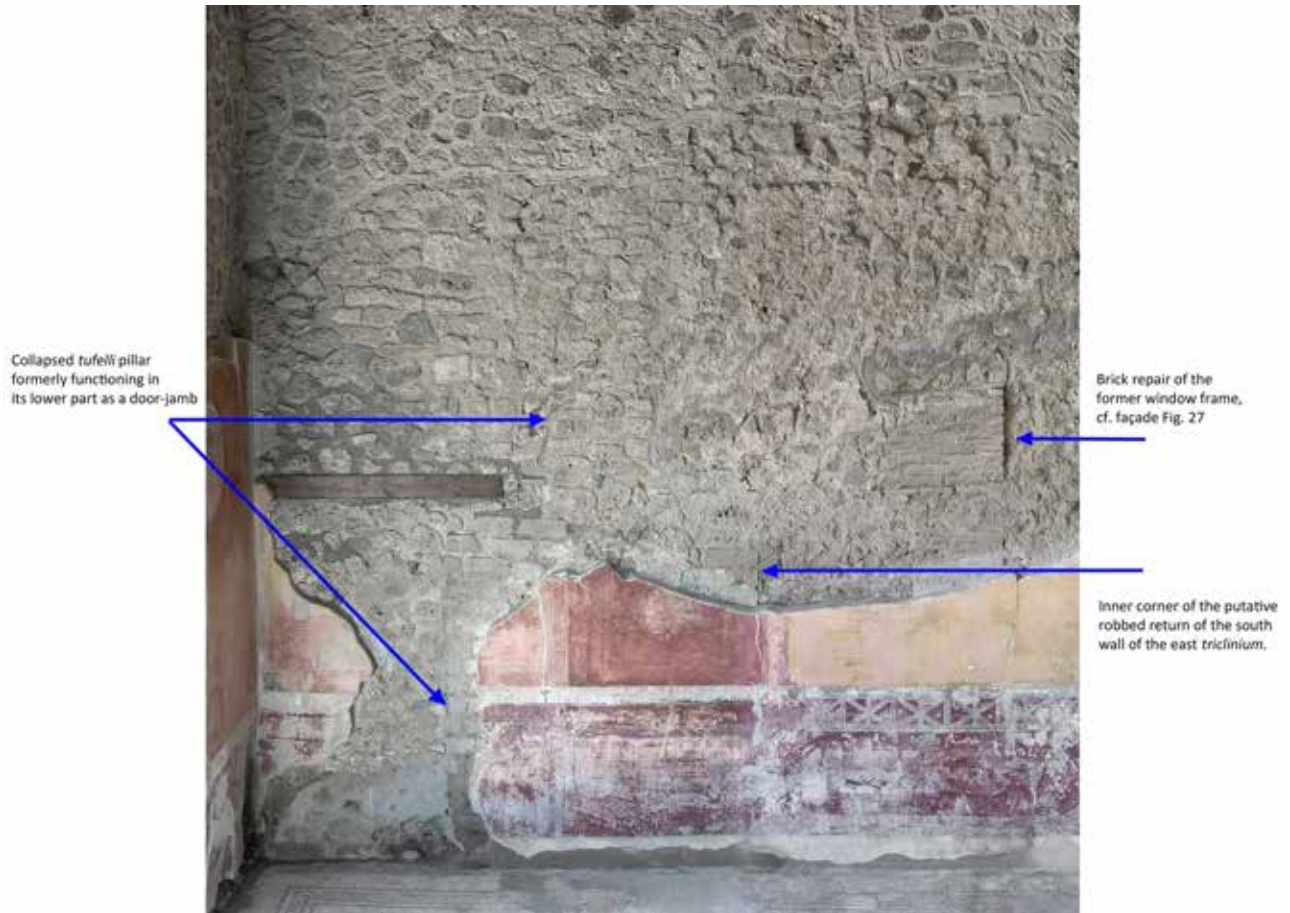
West interior elevation of triclinium V 1,26o. The fallen-off 4th-style decorations reveal construction techniques of and repairs to the wall. Two tuffelli pillars preserve their original position: one framed the entrance of the antechamber, the other standing further north is the putative mark of the return of the wall dividing the earlier east triclinium from its antechamber. Above doorway level, the partly collapsed tuffelli pillar is embedded in an opus incertum fill. This repair belongs to the later phase when the east triclinium was transformed into V 1,26o. A brick pillar, substitute for the former window frame (more conspicuous in the exterior elevation, Figs. 12b, 13, 27), assures the strength of this fill. Photograph: Hans Thorwid. Feature highlights: Henrik Boman.
